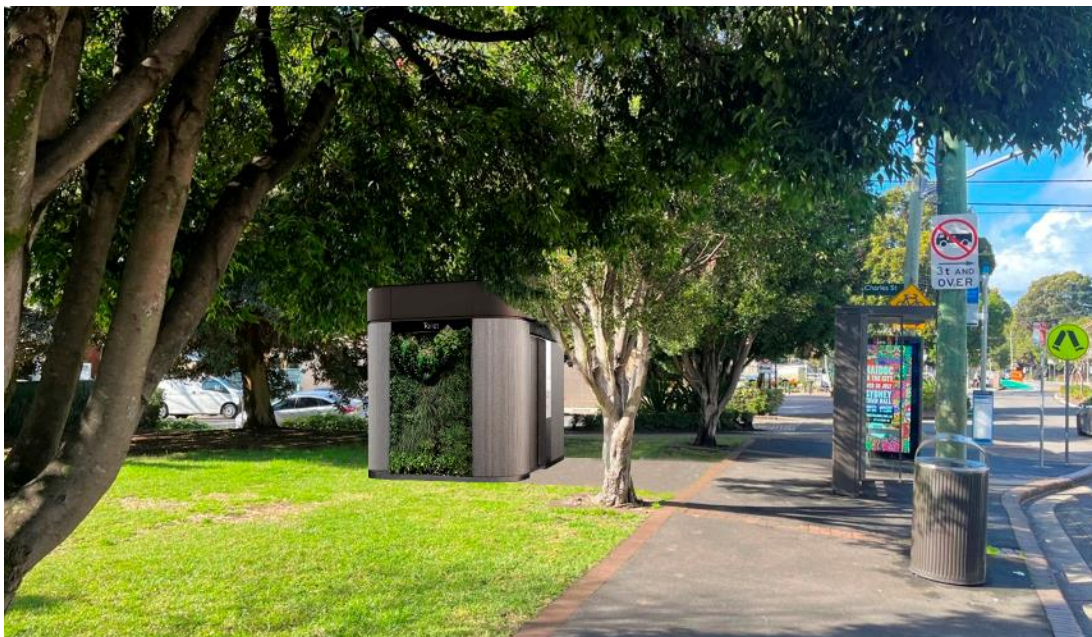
Photomontage of proposed APT looking east along Erskineville Road
